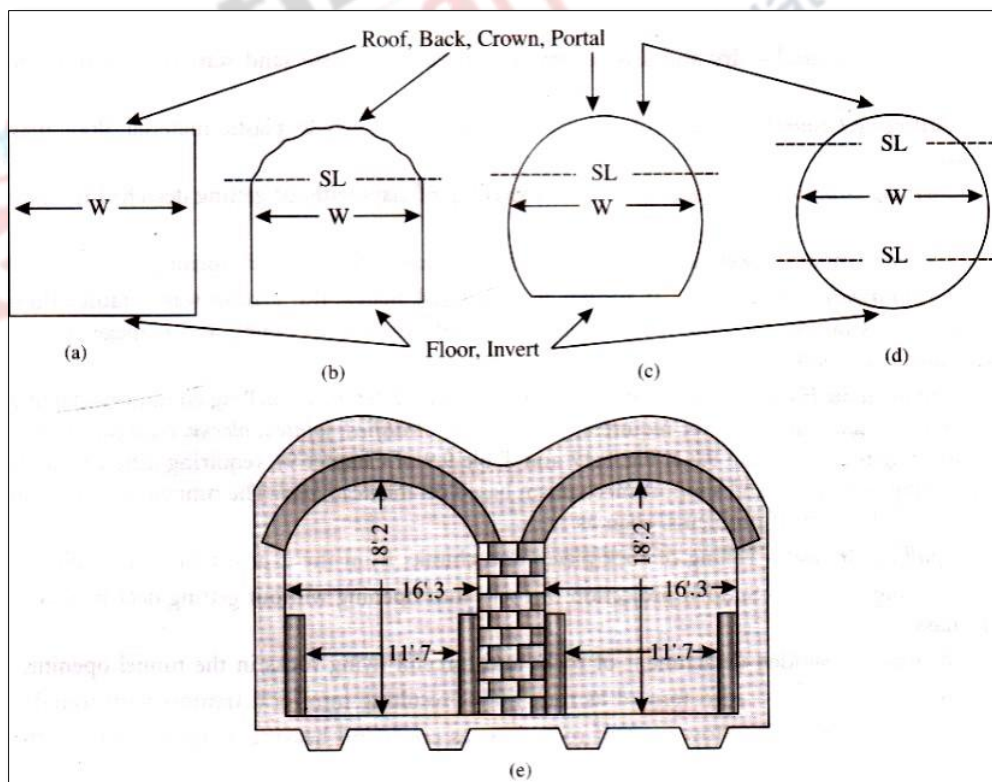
Different kinds of tunnel cross-sections and parts of the tunnel. Square cross-section (a) for soft ground, Arch (b) and Horse Shoe (c) shaped transportation tunnel and circular cross (d) section of water pressure tunnel. (e) A twin tube tunnel cross section.
